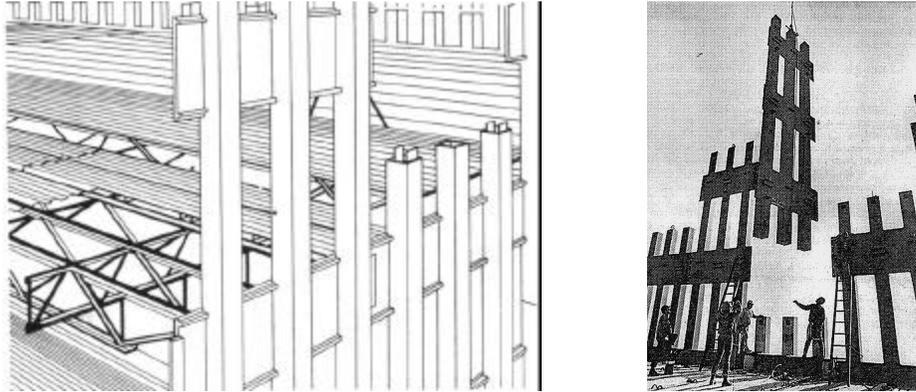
Assembly of the external wall units (alternately staggered in one-story heights) and floor units.
